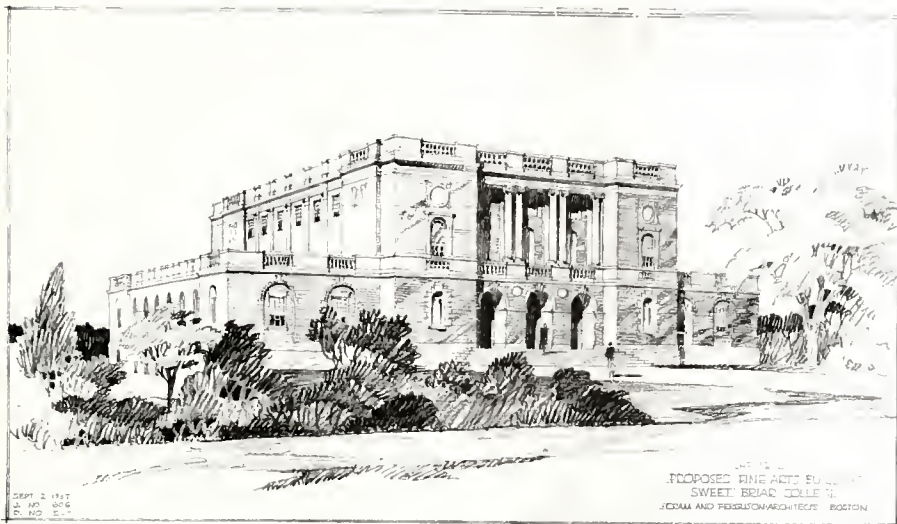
PROPOSED FINE ARTS BUILDING, 1937
